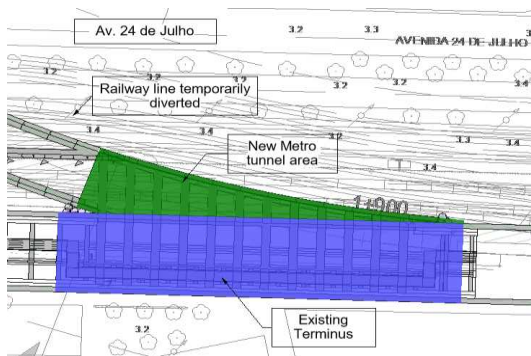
Plan: Layout of the new tunnel and the existing terminus.
